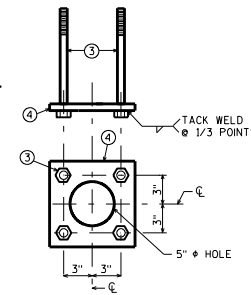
DETAIL FOR END POSTS WITHOUT THREE BEAM RAIL ATTACHMENT
